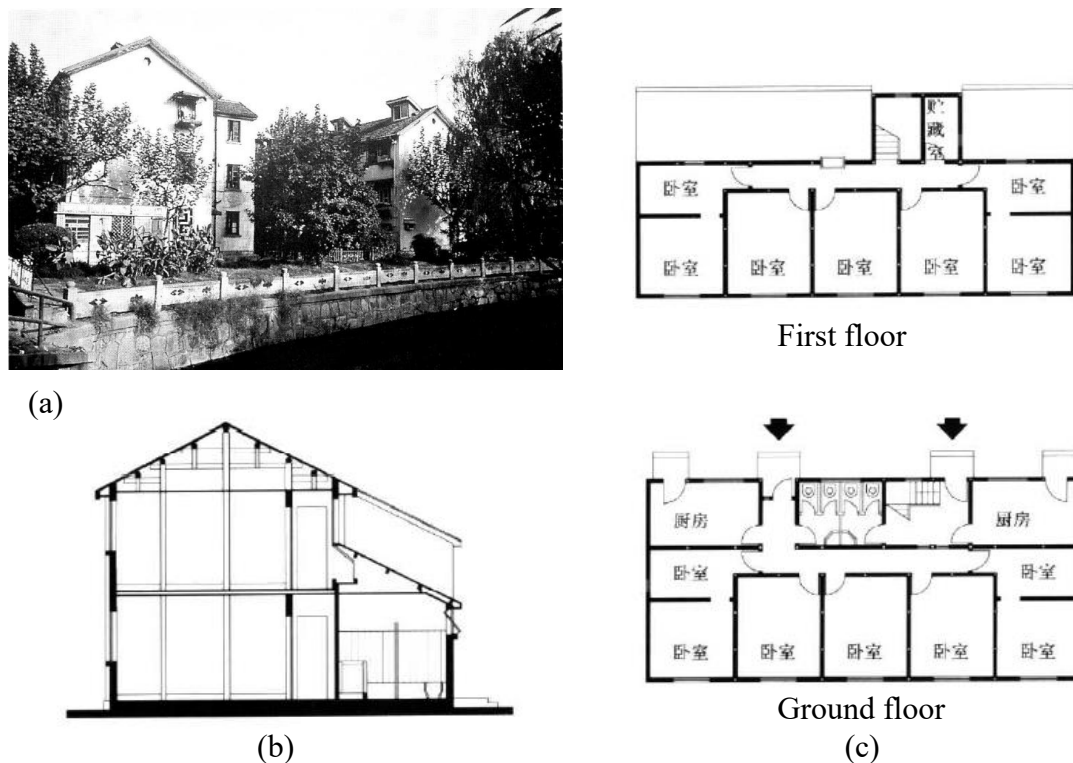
Perspective view (a), Section (b) and plans (c) of Shanghai Cao Yang Xin Cun Residence. From Lü, Rowe, and Zhang (2001).
